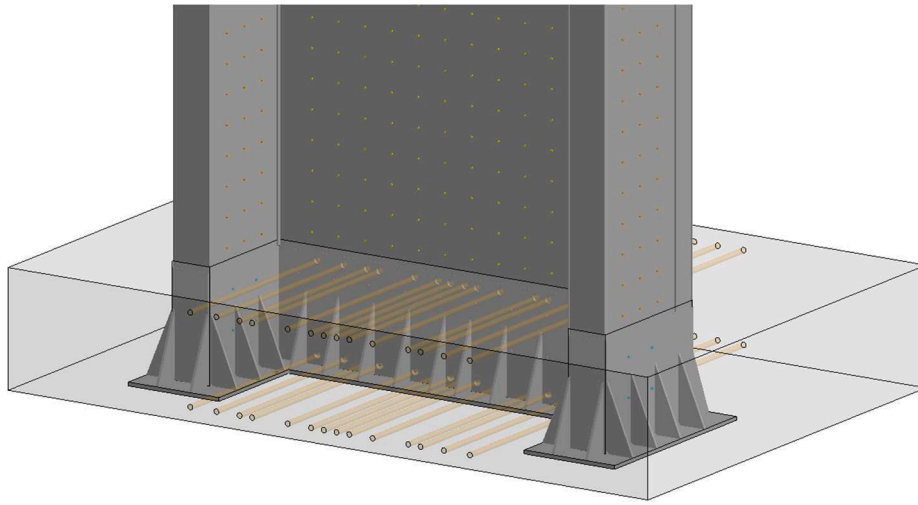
Composite wall-to-basemat connections with wall embedded into concrete footing.
